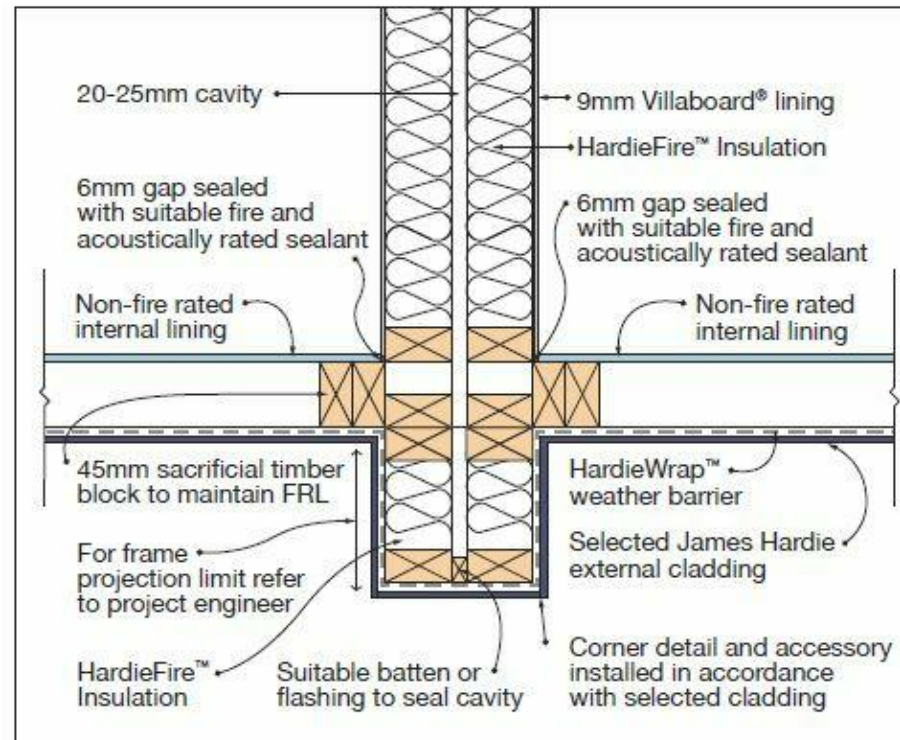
HARDIESMART™ INTERTENCY WALL SYSTEM EXTERNAL PROJECTION TO LIGHTWEIGHT FAÇADE
